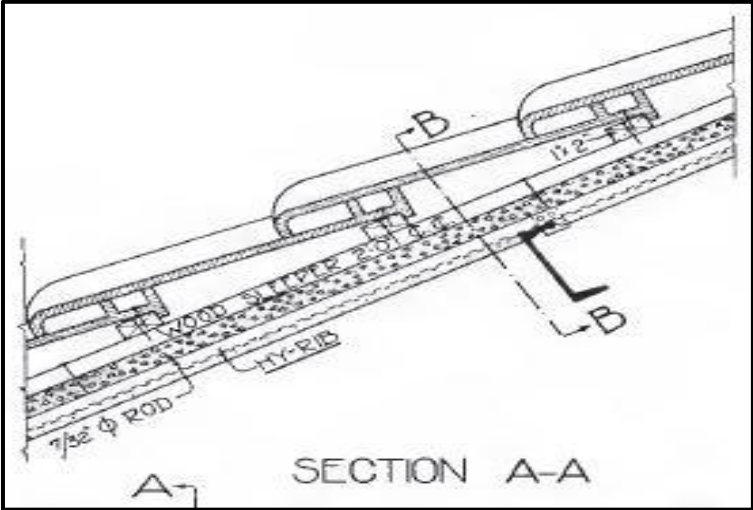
Hy-Rib Saw Tooth Roof Drawing.
